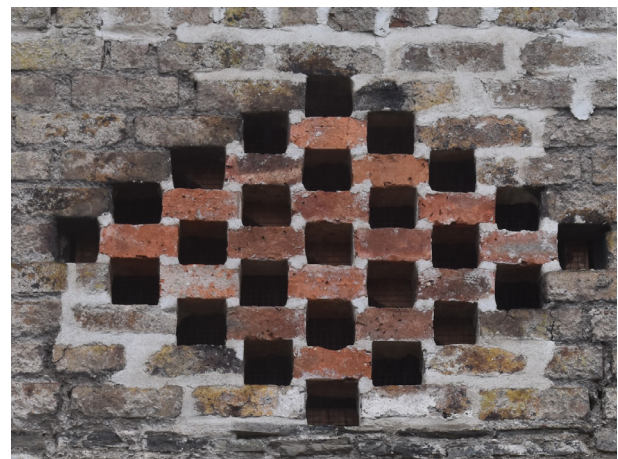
Building 3, Diamond shaped brick in a perforated checker-board pattern.
